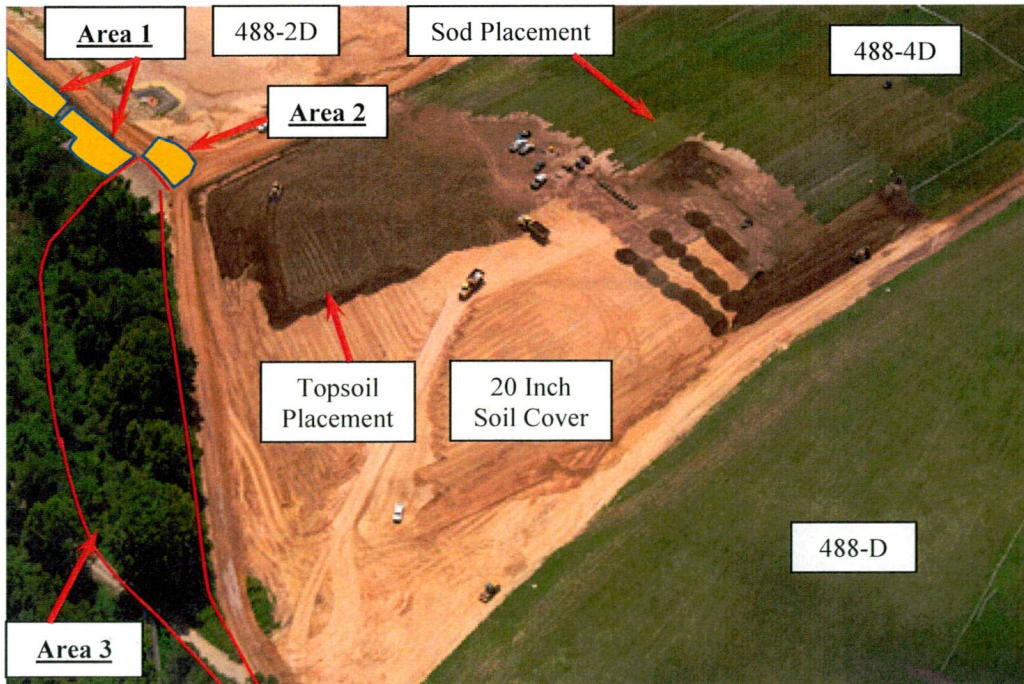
488-4D Topsoil and Sod Placement Ongoing
